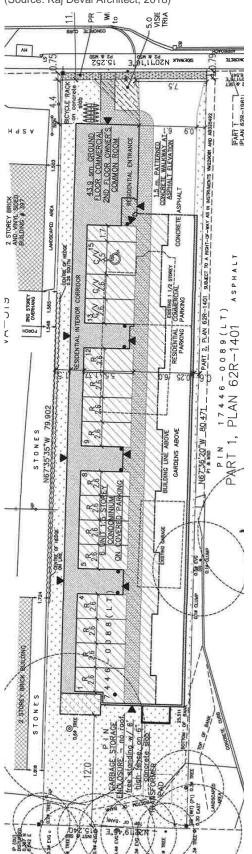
Conditionally Approved Site Plan (Source: Kaj Devai Architect, 2018)
